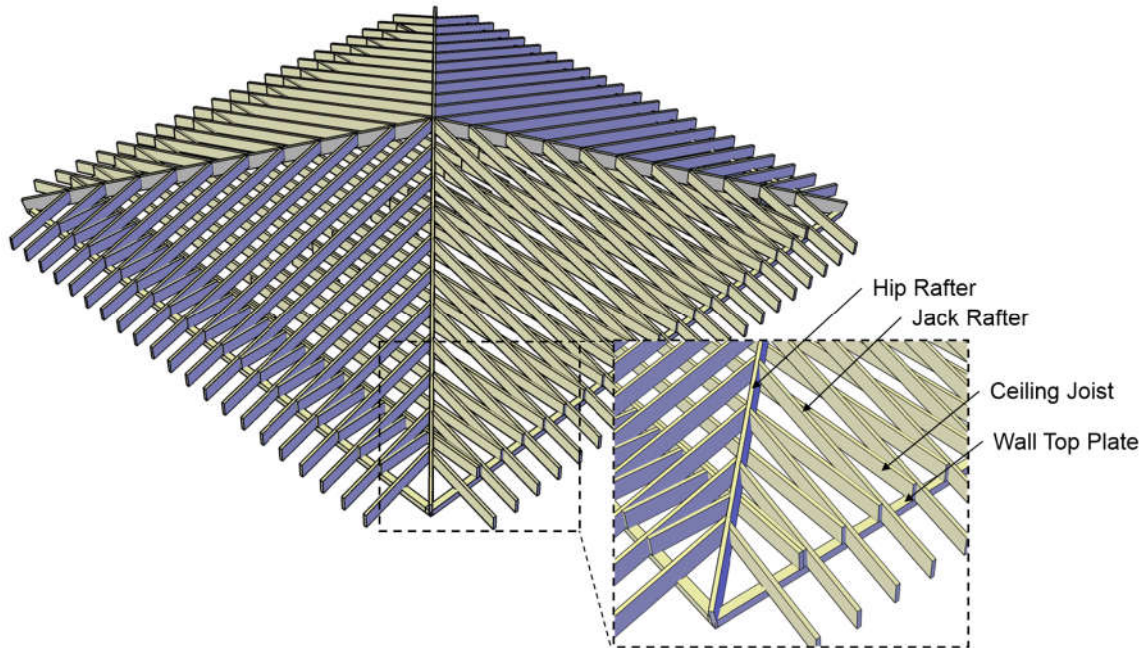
Illustration of Stick-Frame Hip Roof with Components Labelled
